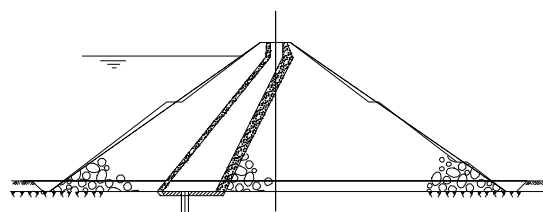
Typical cross-section of a rockfill dam with an inclined clay core (Salto Osório hydropower plant).
